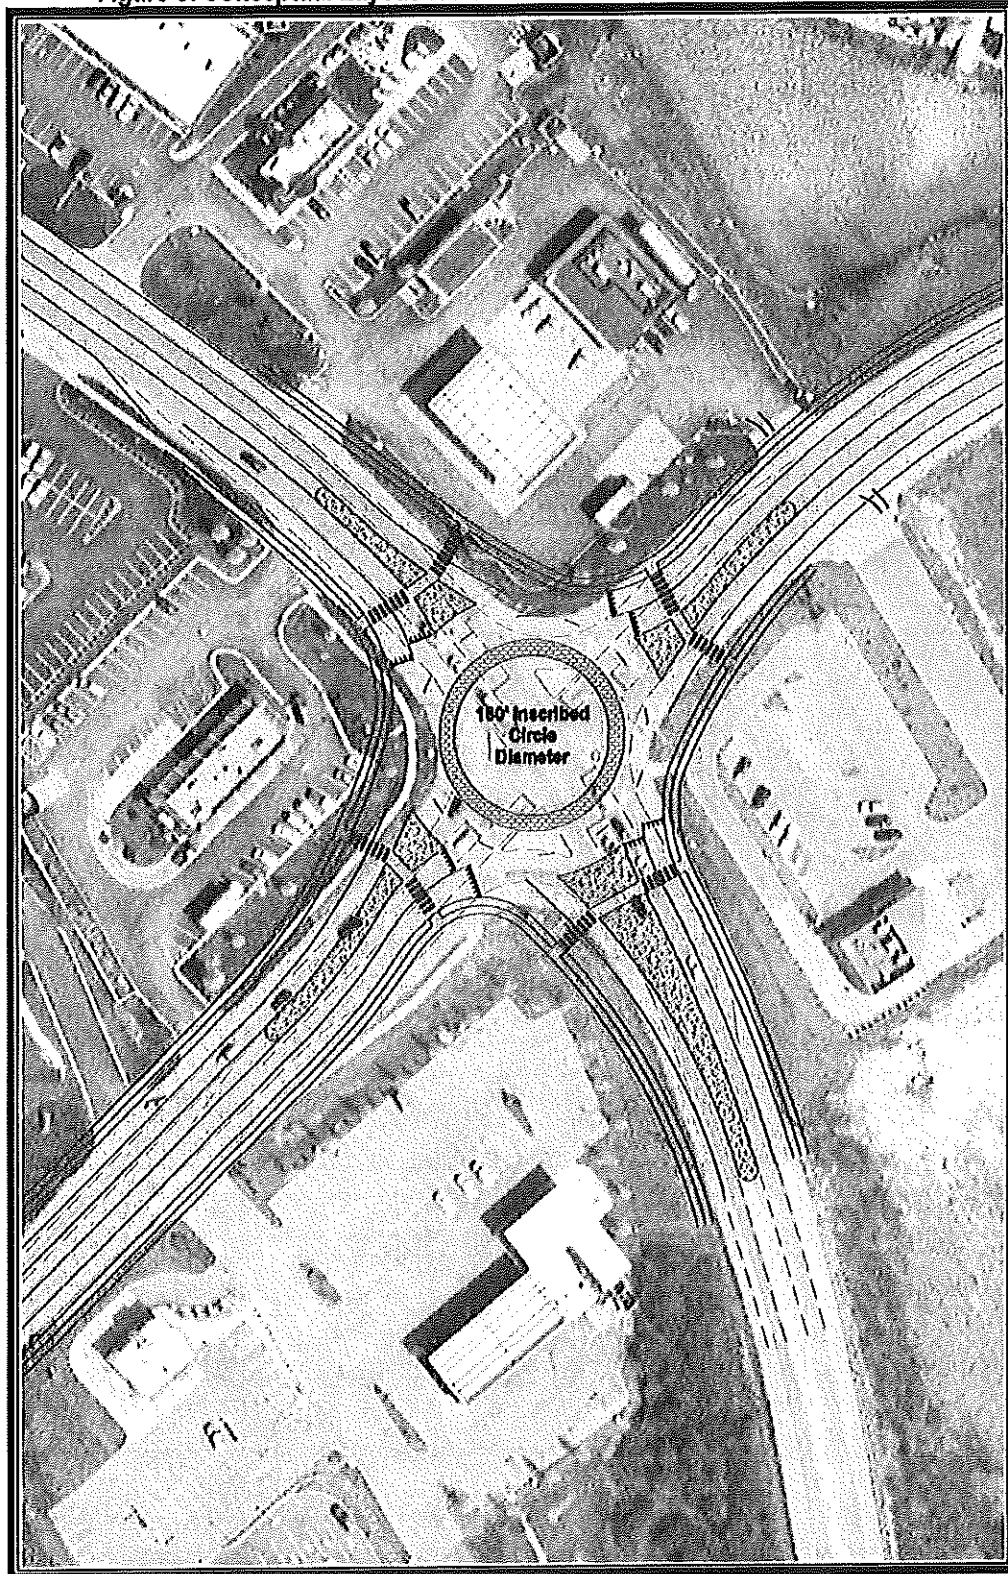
Conceptual Layout of Minimum 180-Foot Two-Lane Roundabout
